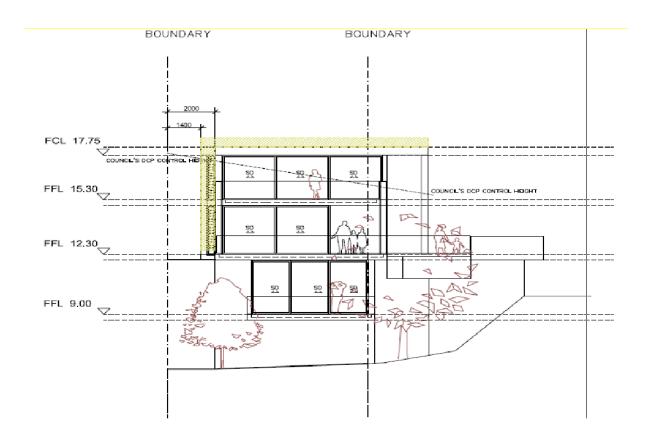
The extent of the LEP height limit variation within the dwellings western elevation (facing beachfront). The yellow section details the height profile of the original proposal.
